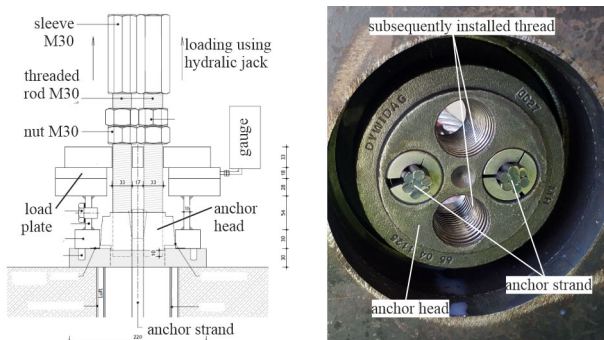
Example of retrofitting an anchor load plate on a partially occupied anchor head.
